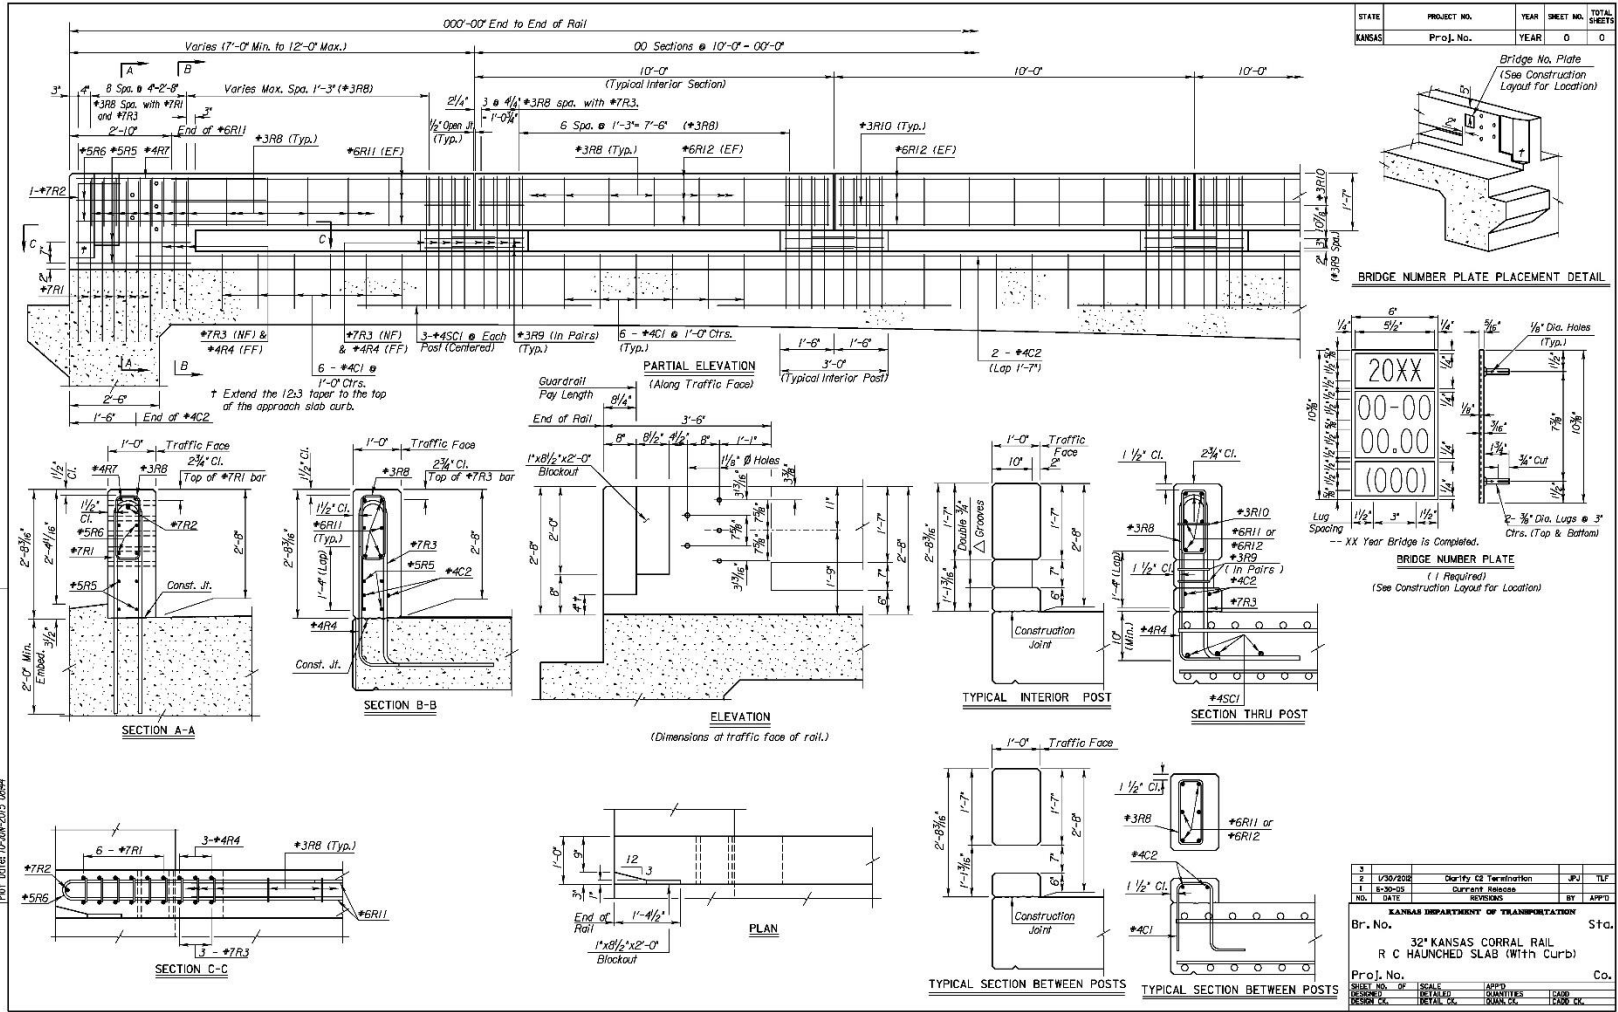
KDOT Open Concrete Corral Rail Details [8]
